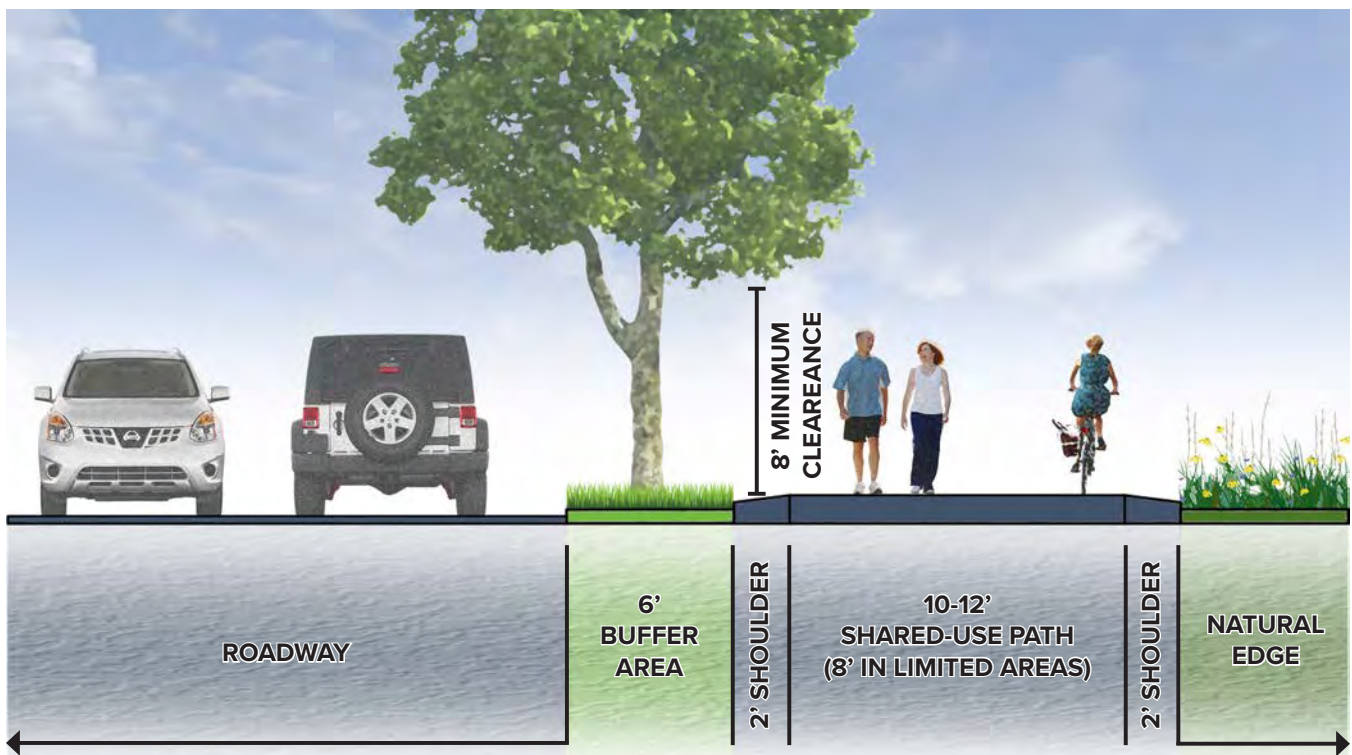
Typical cross section illustrating how the Jasper-Huntingburg connection could be developed as a sidepath along Old Huntingburg Road.
